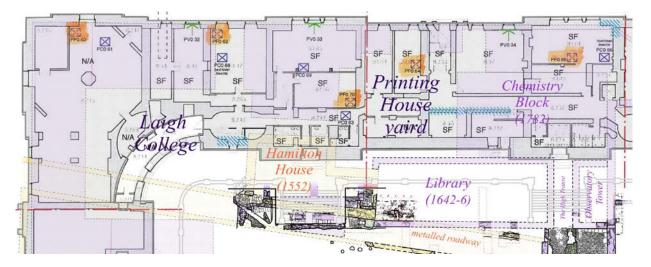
Early college buildings (purple/yellow) overlain onto proposed trench location plan
